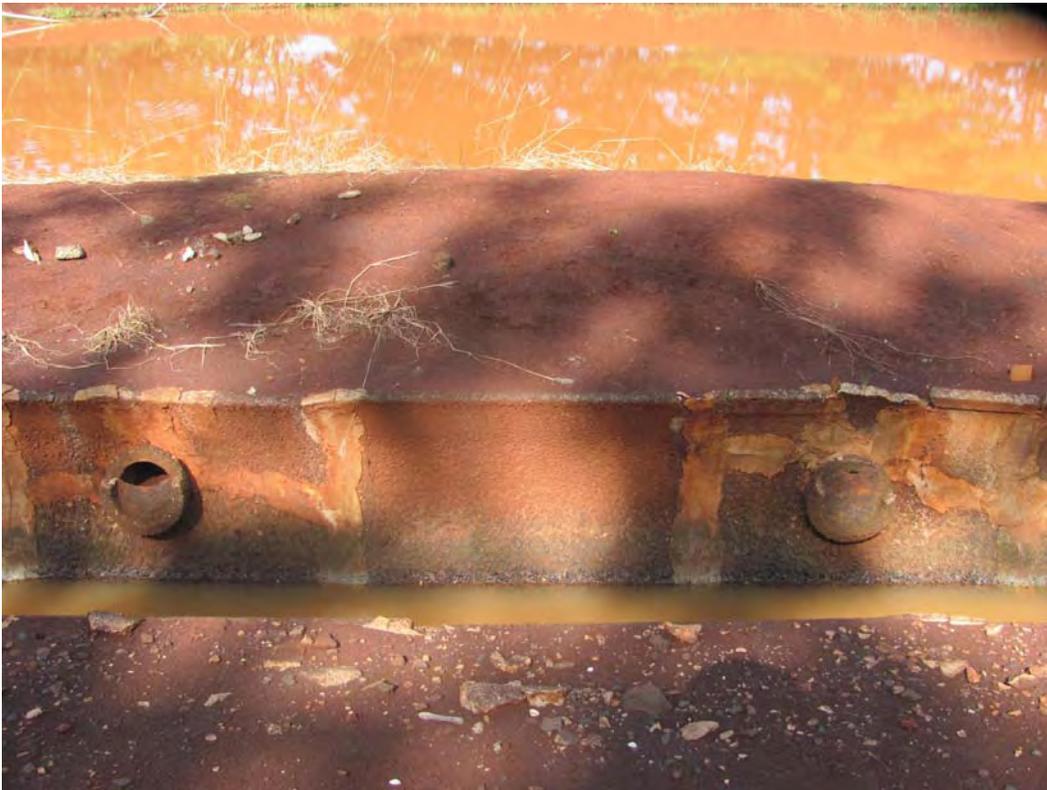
Site 7170 Section 2 concrete overflow pipes, view to the west.
